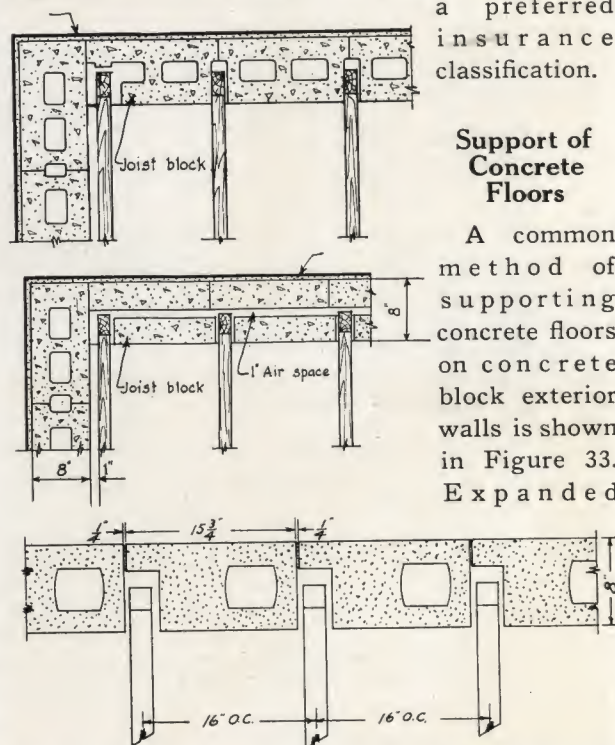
Common types of joist block for hollow block and two-piece block wall construction.
